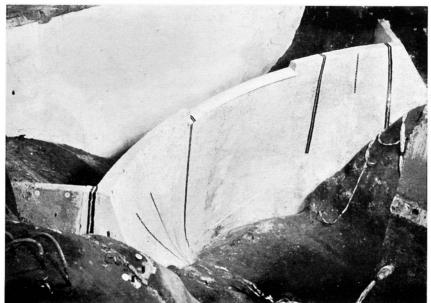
Kurobe IV Dal. Structural model at failure, showing the opening of joints.
